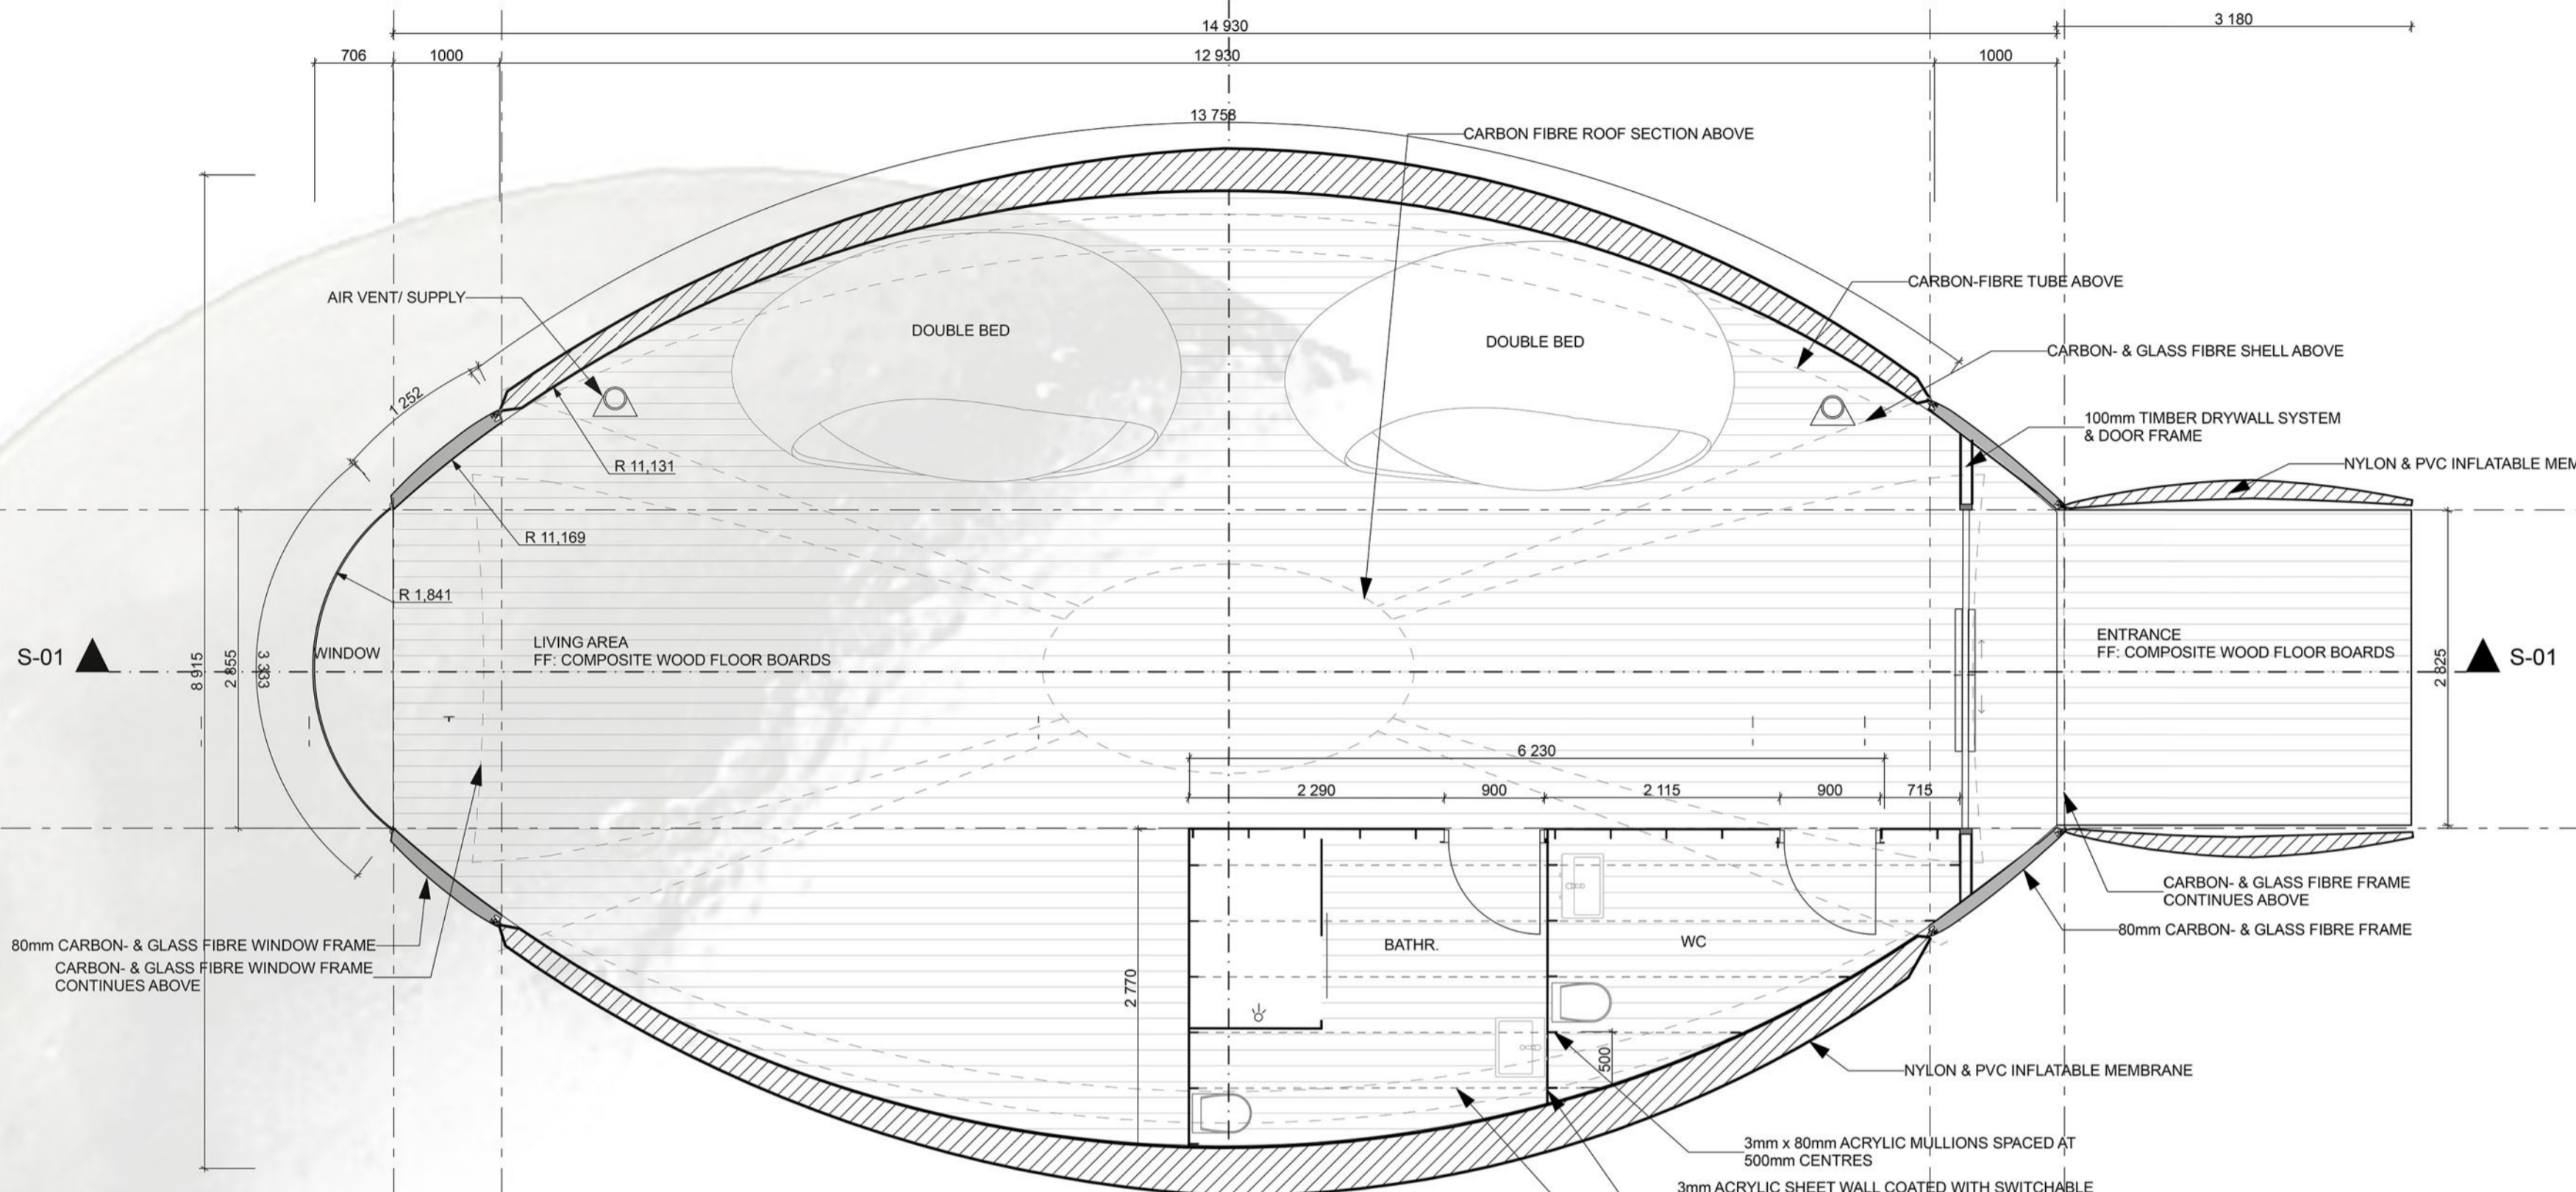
PERSPECTIVE THIRD FLOOR PLAN
